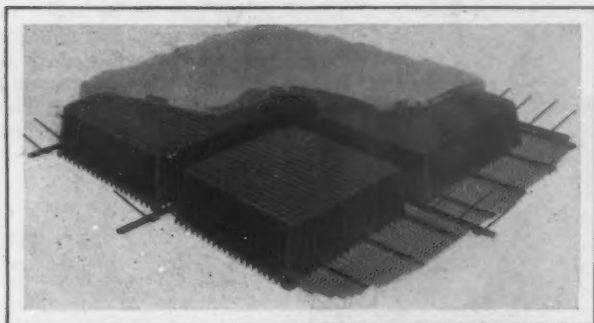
A New Type of Construction Known as the Floredome Developed by the Trussed Concrete Steel Company, Detroit, Mich.
